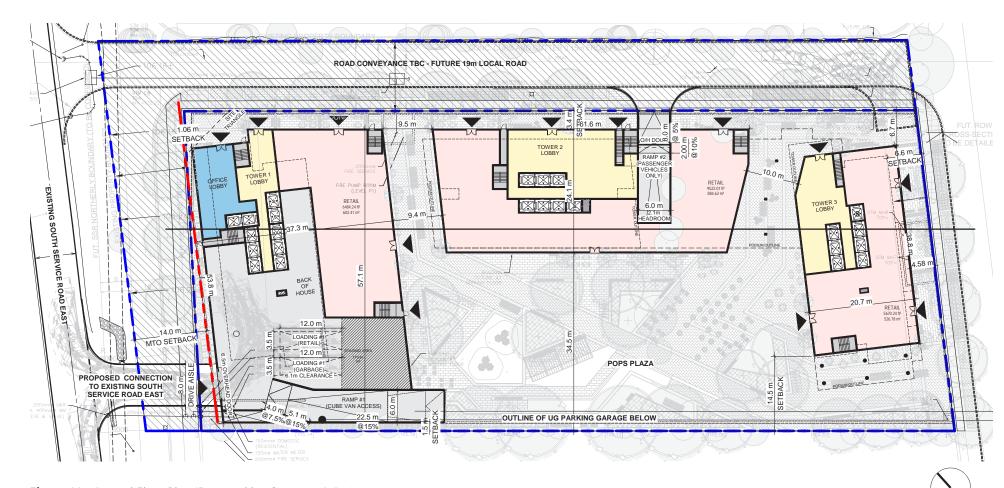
Ground Floor Plan (Prepared by: Sweeney & Co.)
